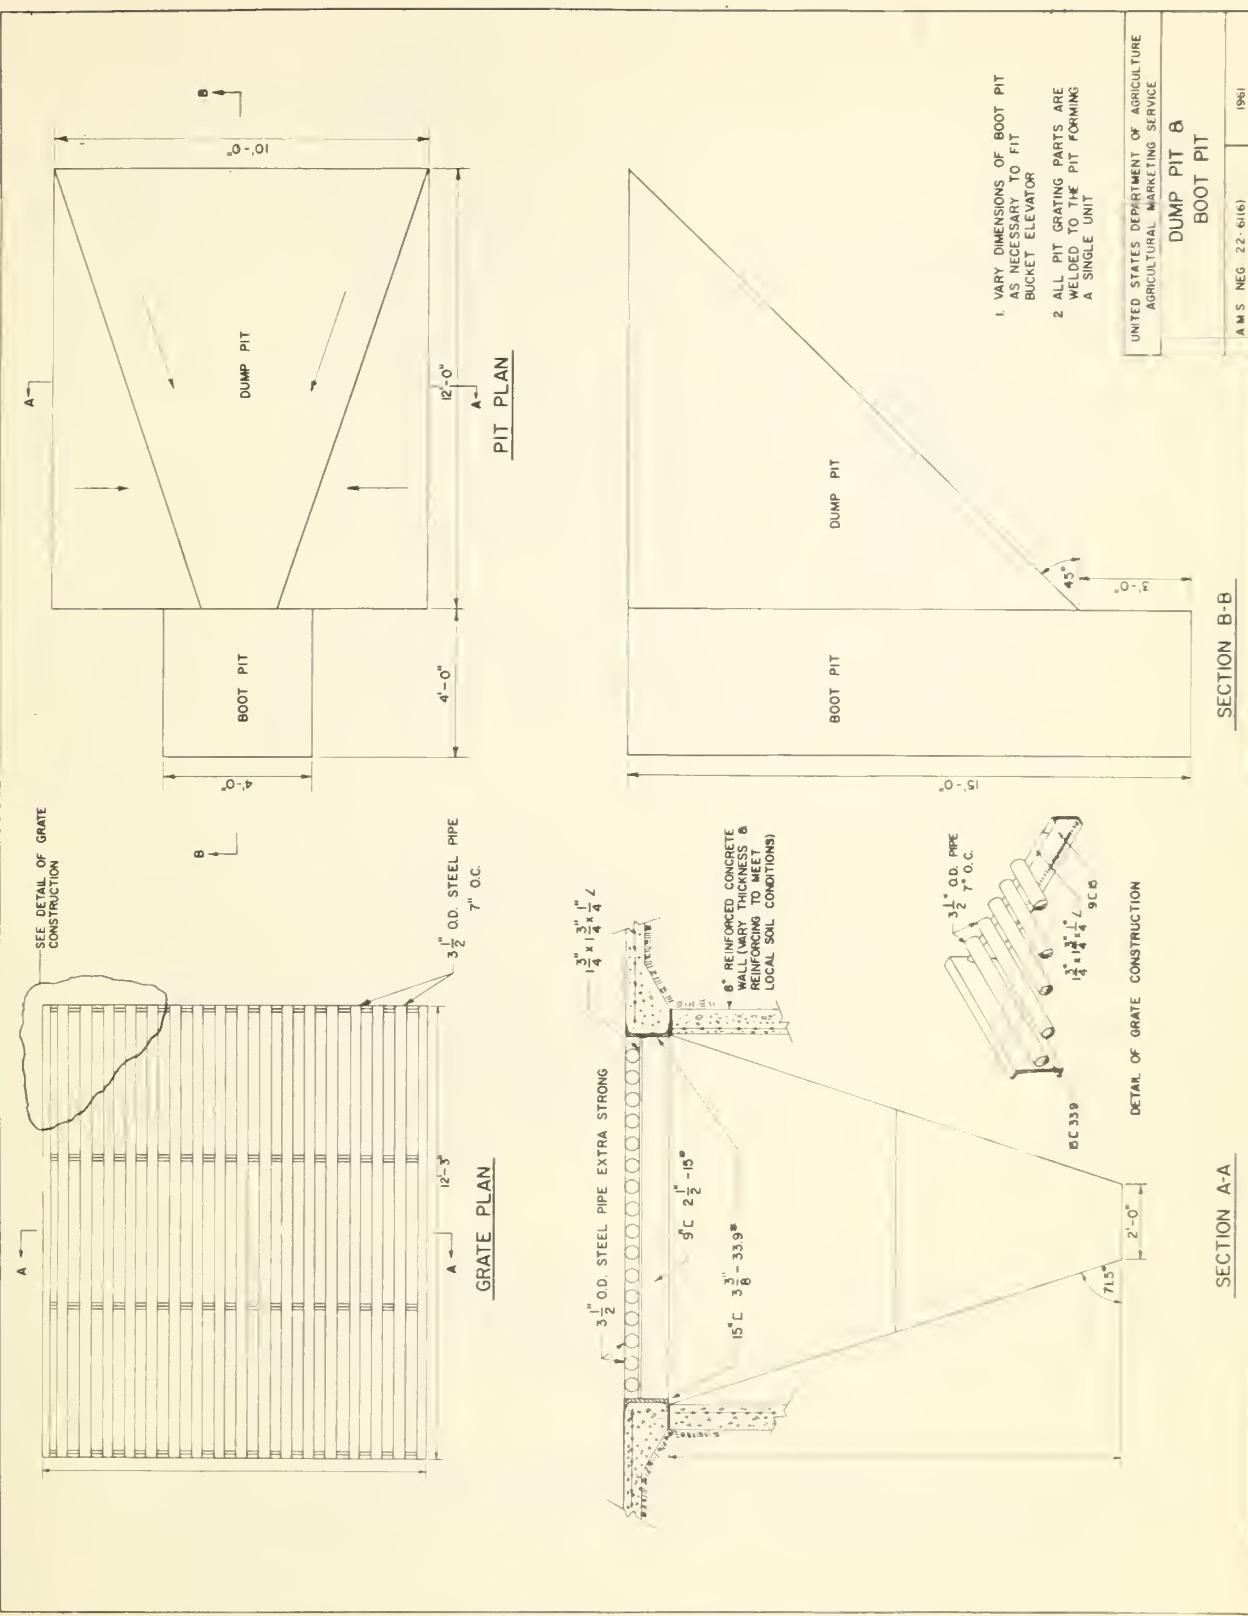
Construction details for the improved dump pit and boot pit and grate.
